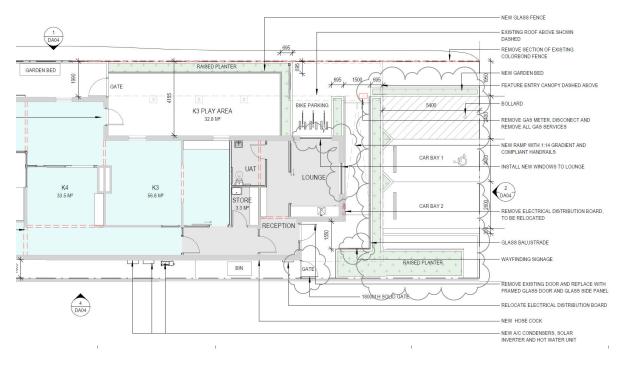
Revision 4 (19.12.2022) plans - proposed parking configuration on Cheriton Street
